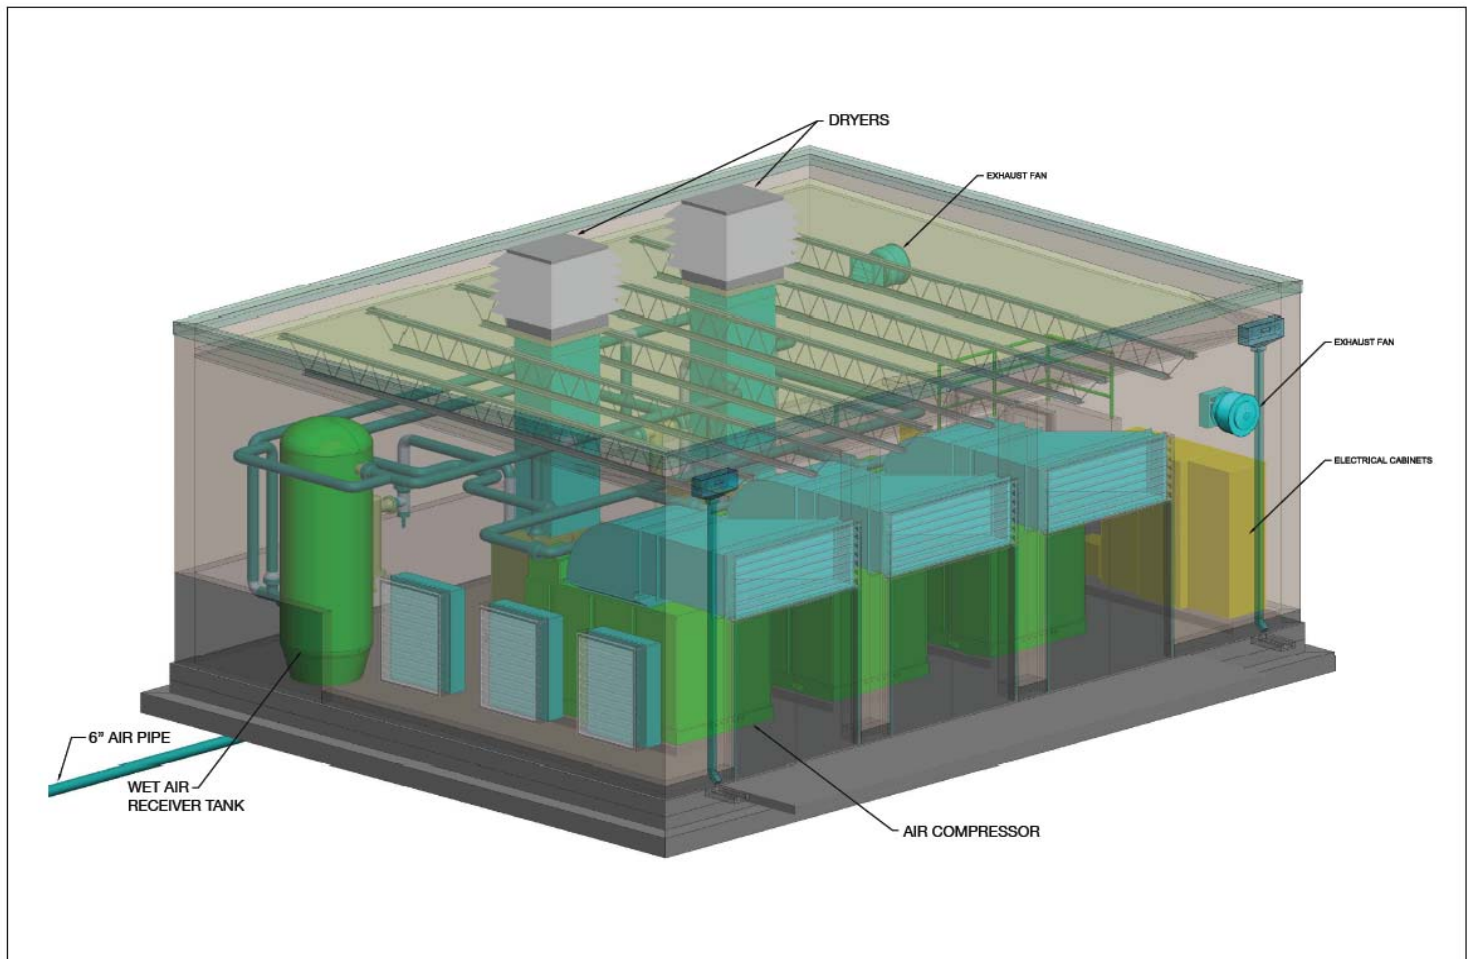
Plant Instrument Air System Conceptual Building Isometric Rendering
